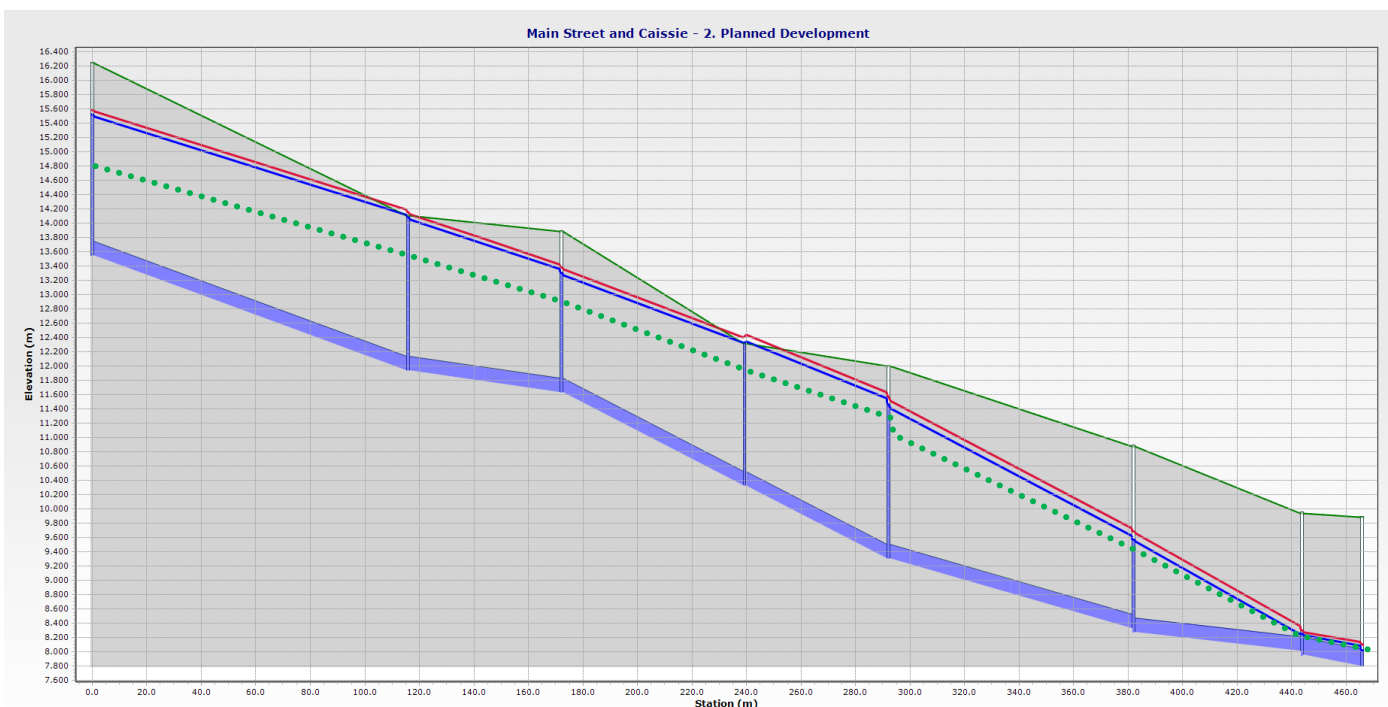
Planned Development - Main Street and Caissie Avenue
